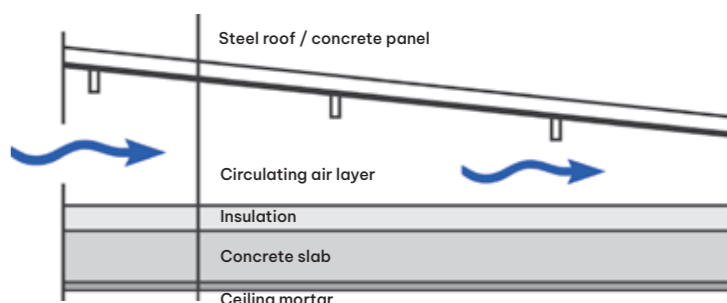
Sloped roof structure (Source: Pham Thi Hai Ha, 2018)
